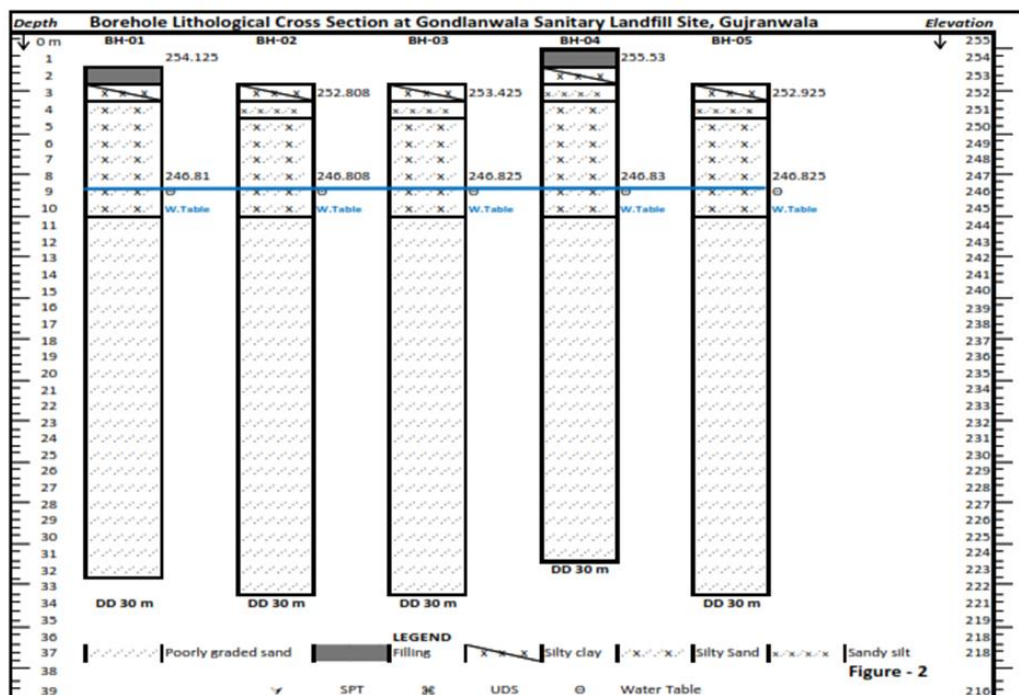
Boring Logs at Gondlanwala Existing Disposal Site
